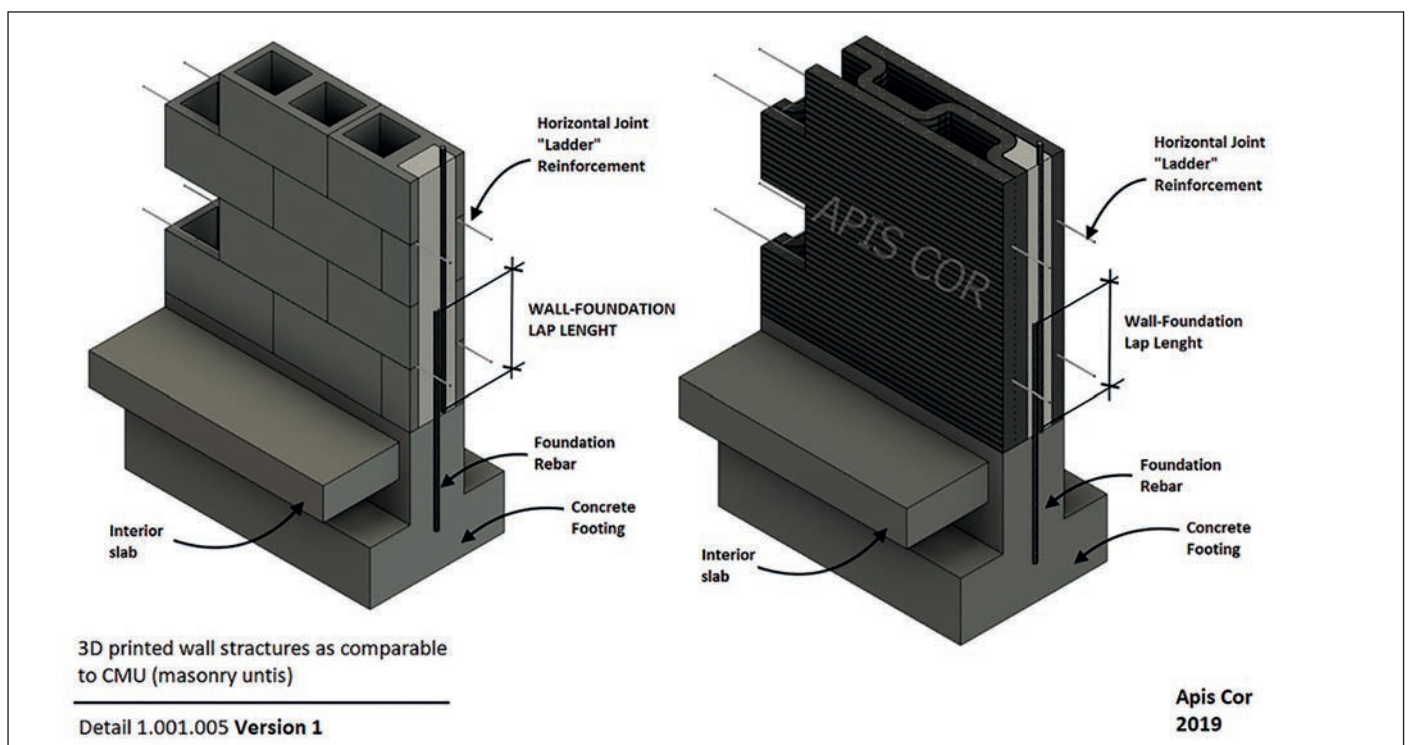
Apis Cor 3D printed concrete wall structure equivalent to a concrete masonry unit. (taken from the Apis Cor web site [24])
